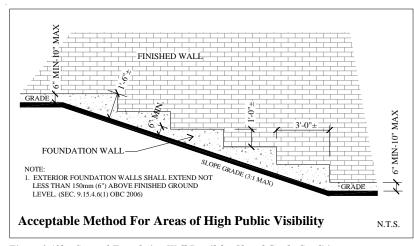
Stepped Foundation Wall Detail for Sloped Grade Conditions
